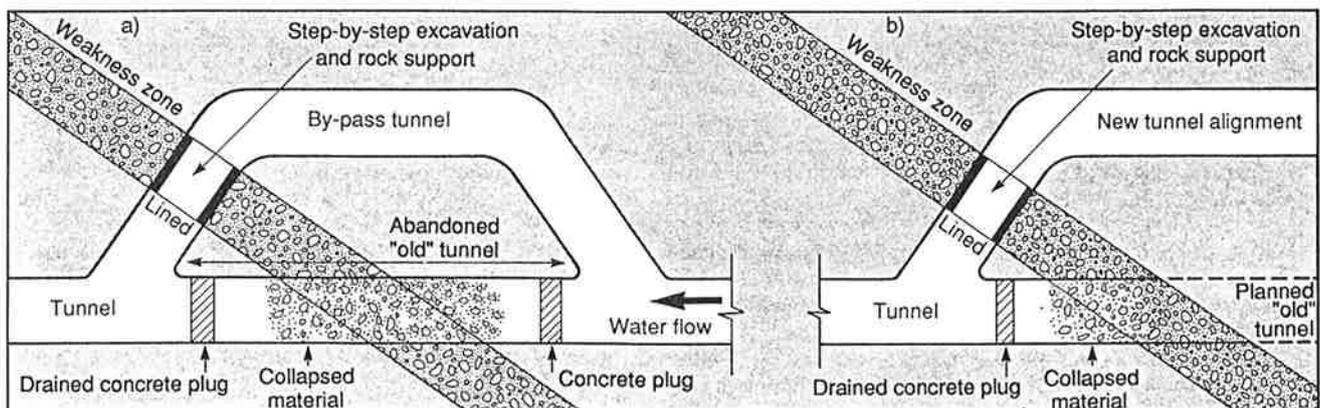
Examples of by-pass tunnels if large, progressive collapses occur in tunnels conveying water: a) slide occurred after tunnel excavation was completed; and b) during tunnel excavation.
